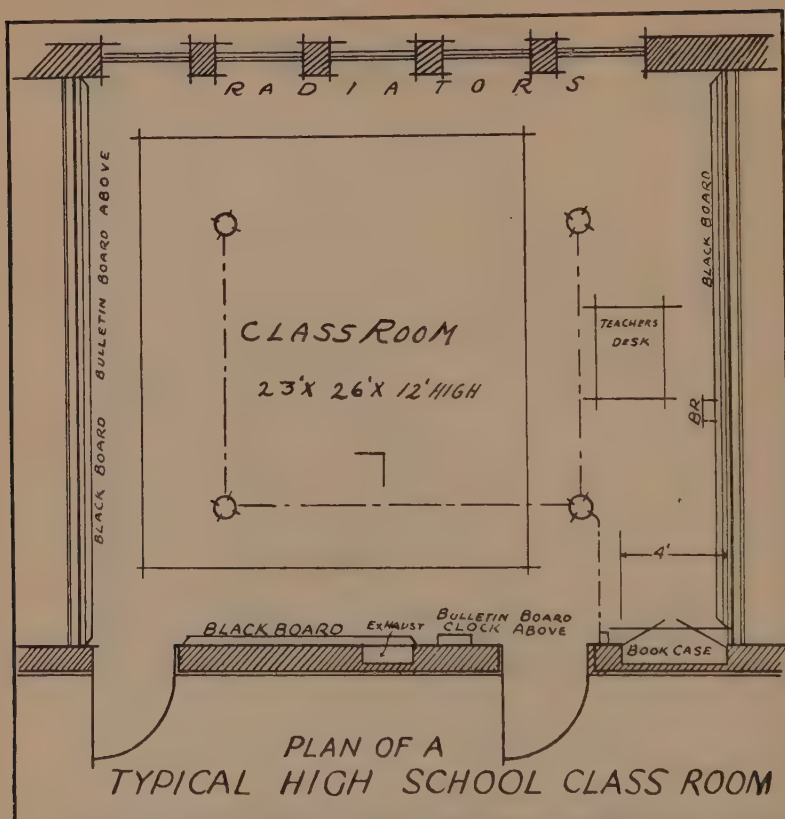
Note the differences between this plan for a high-school classroom and the elementary-school-classroom plan shown in Fig. 11
